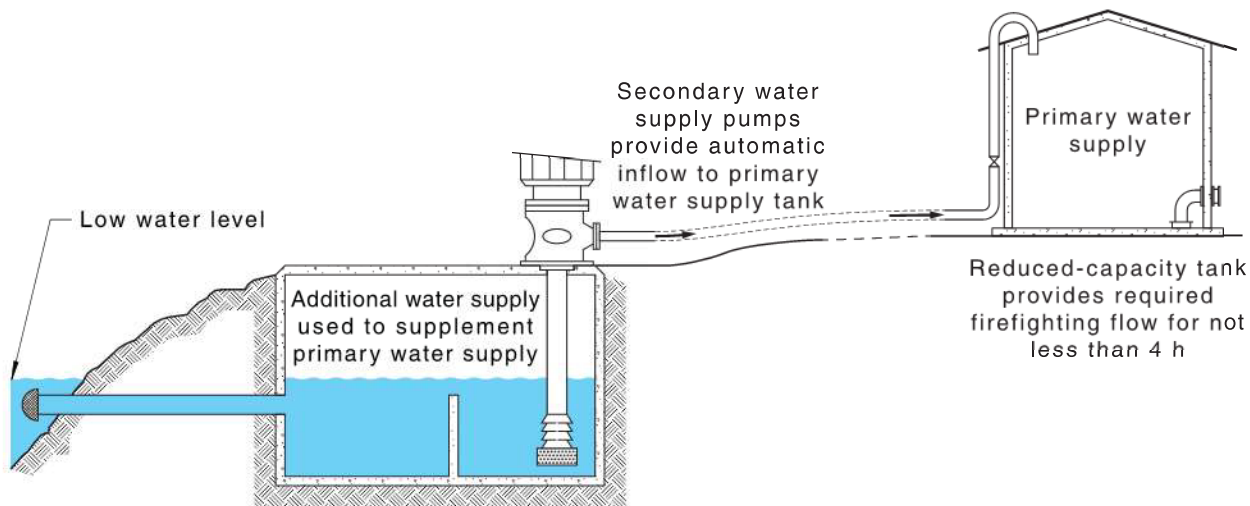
(A) — Conduit or pipe feed to inflow water supply pumps
